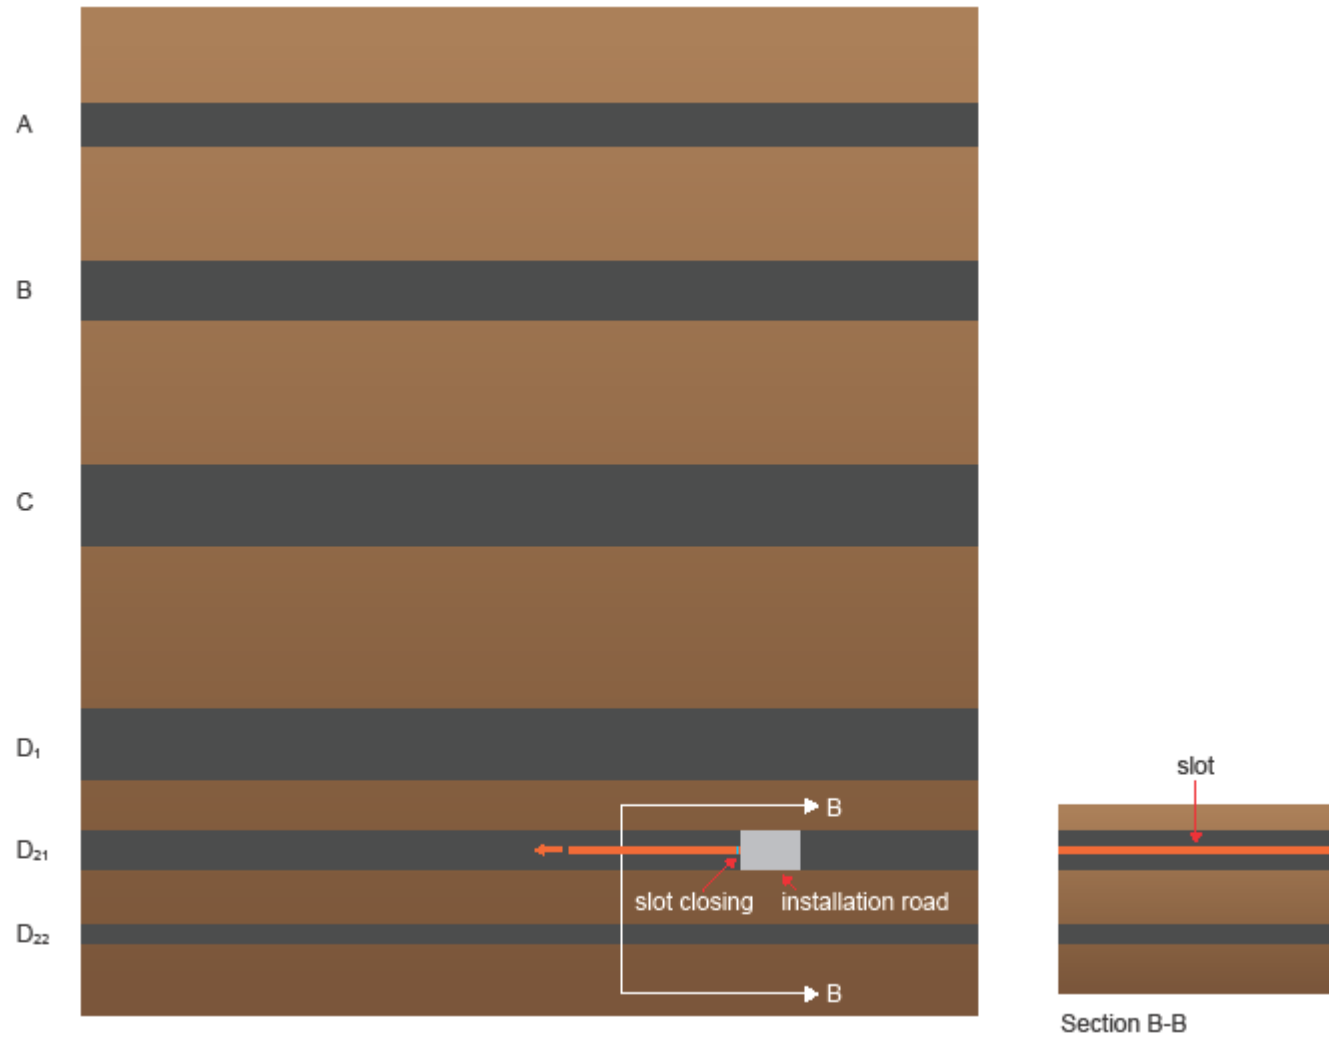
Slot longwall block between gateroads to de-stress and de-gas – elevation
